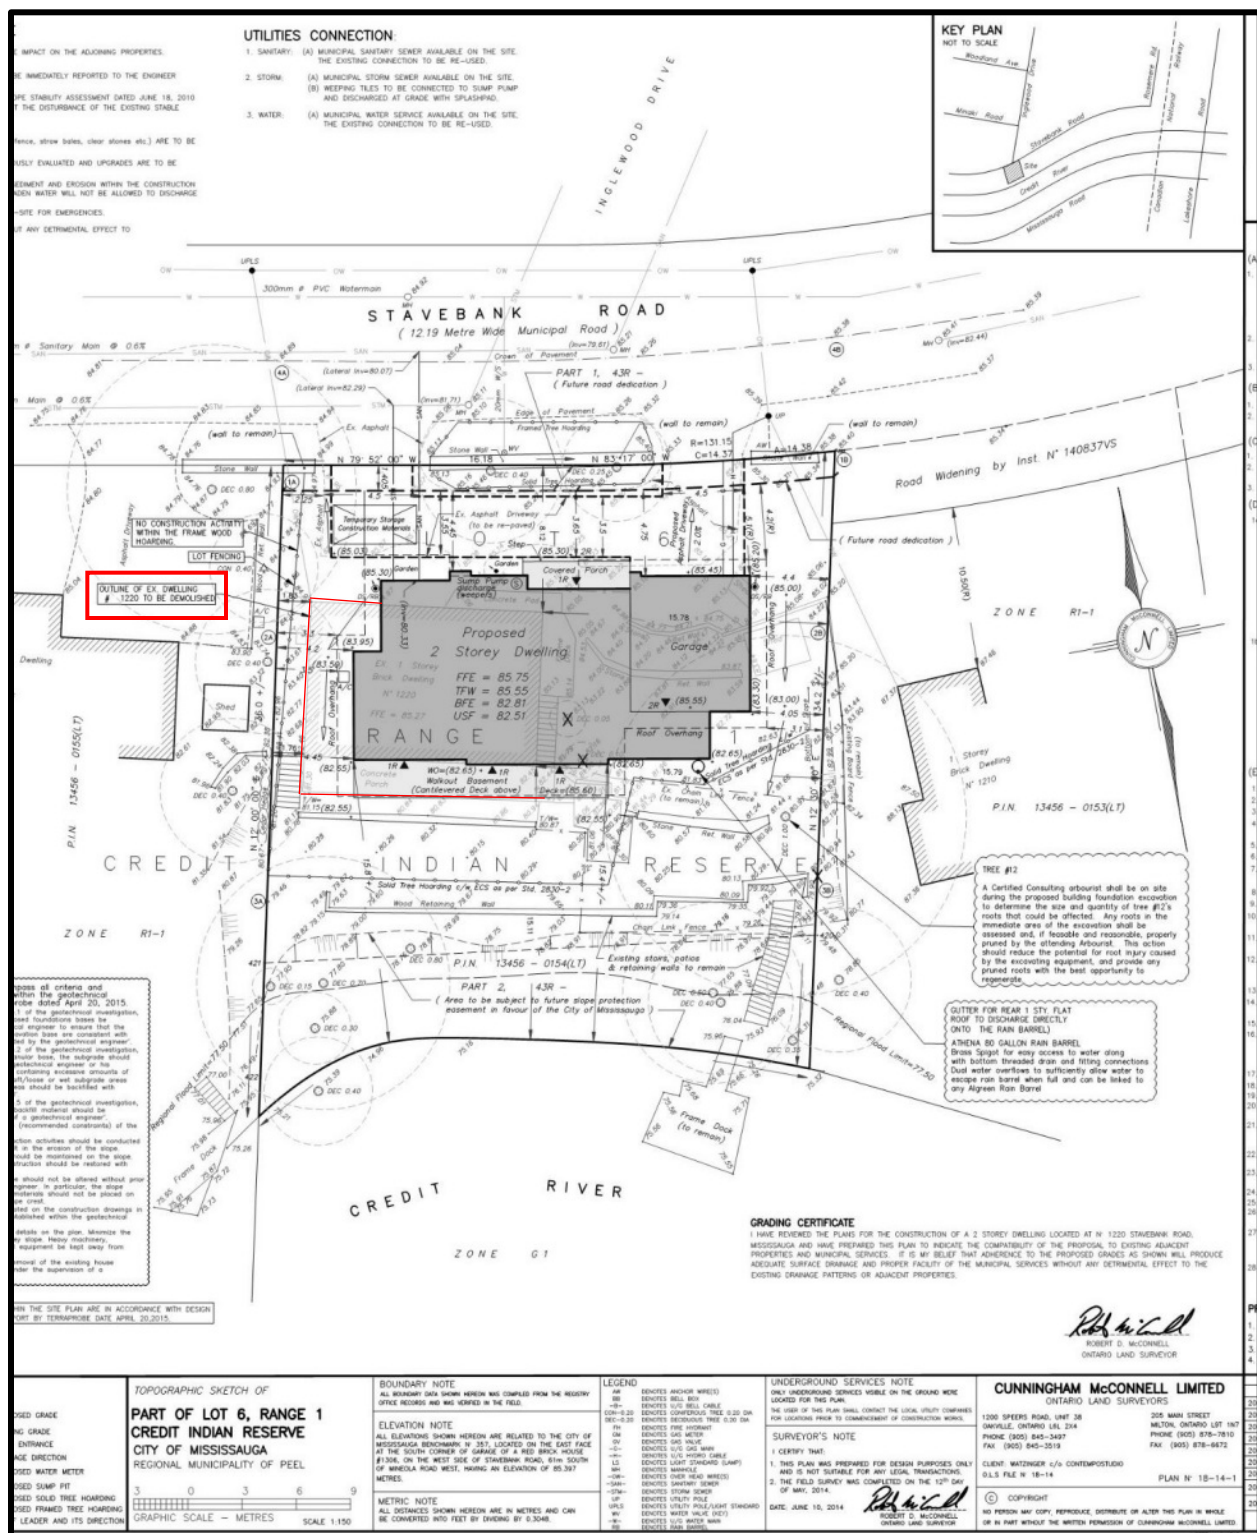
Proposed Development- Site Plan showing outline of existing residence in red.
